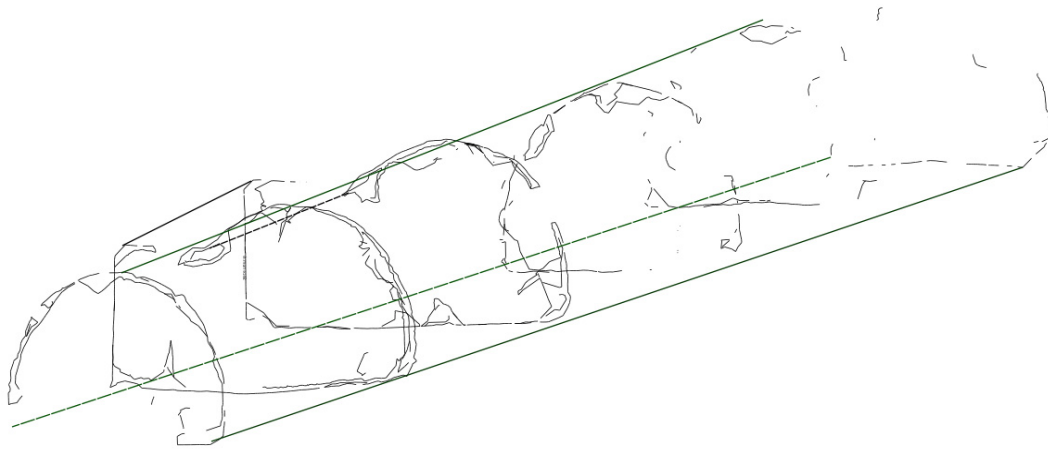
Cross-sections of the excavation developed basing on the 3D model, intersected by vertical planes every 1.5 m.
